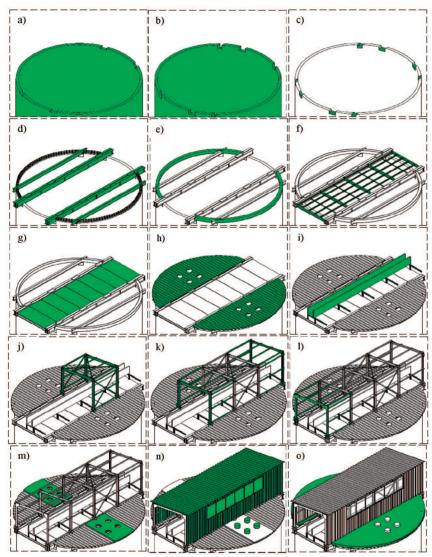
Stages of execution of the designed structure: a) state after disassembly of the ceiling; b) sockets of ceiling beams; c) epoxy-mineral mortar under steel beams; d) steel ceiling beams; e) rim on silo jacket; f) grate in the gallery area; g) ribbed sheeting in the gallery area; h) trapezoidal sheeting of the ceiling in the area outside the gallery; i) redler with subconstruction; j-l) structure of the gallery – section 1÷4; m) monolithic slab on the trapezoidal sheet; n) housing of the gallery and installation of venting devices on the silo ceiling; o) finishing layers of the silo ceiling
